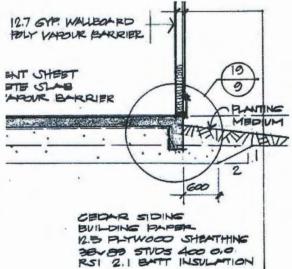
Exterior wall assembly with horizontal cedar siding (from Howard Yano Architects).
